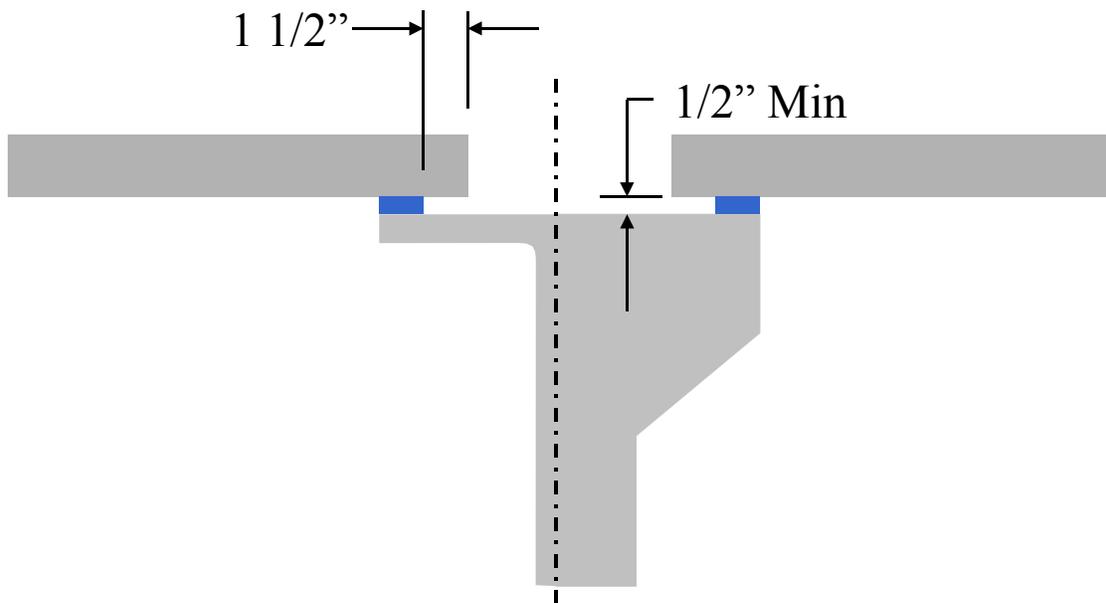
Typical Installation of PCP on Steel or Prestressed Concrete Girders
